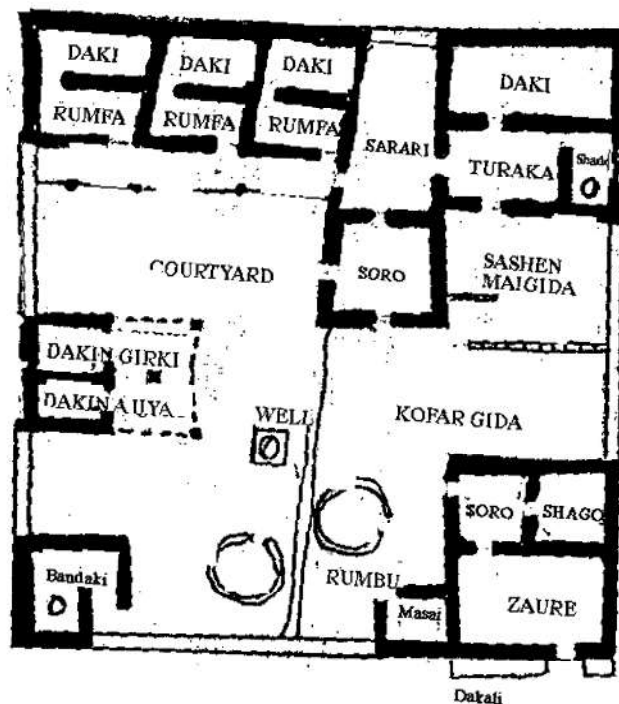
Plan of a typical Hausa house showing *daki* and *zaure* (Saad, 1981).
